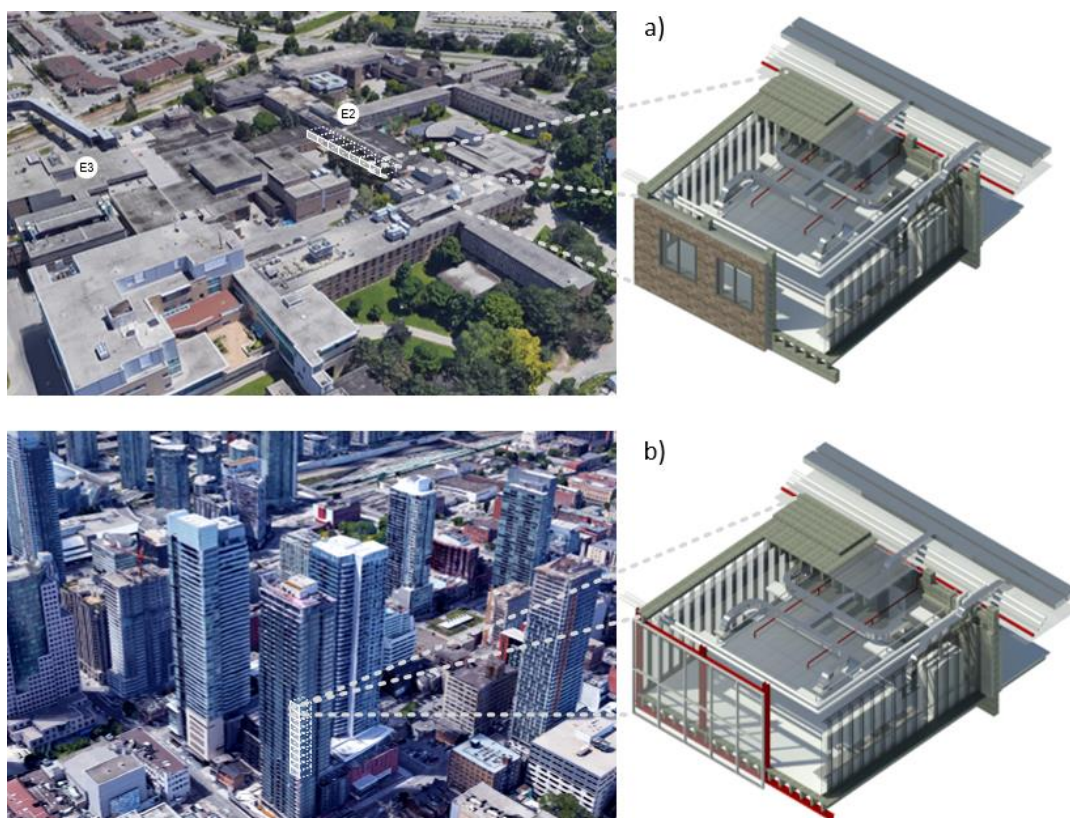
Examples of repetitive modular units in the built environment: a) set of lab rooms with a recurrent layout, and b) repetitive apartment rooms on a high-rise building.
